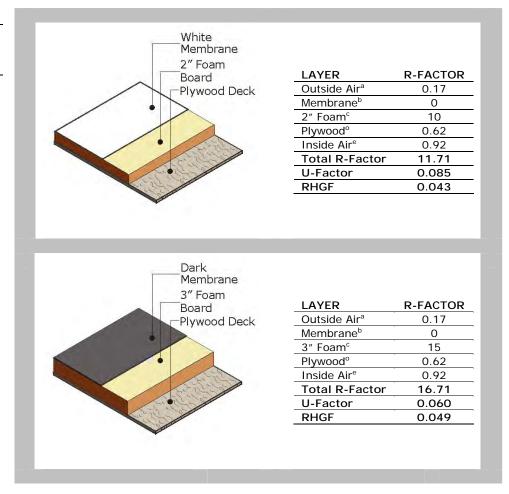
(cont'd.) Low-slope plywood deck roof assembly
